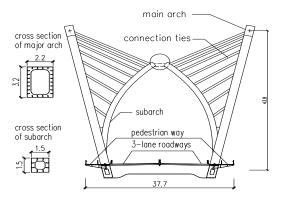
Elevation of the hybrid arch-girder structure in main navigation span
